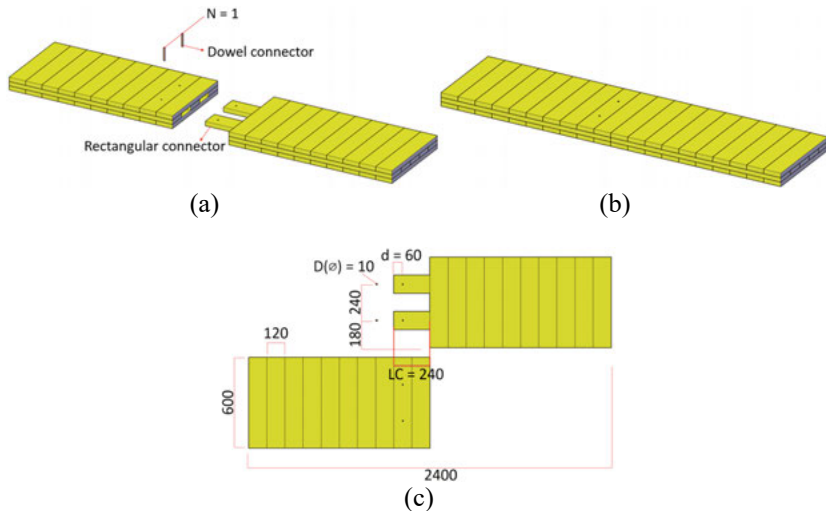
DS connection, (a) involved components, (b) assembled illustration, and (c) dimensions at front view. (unit in mm)
